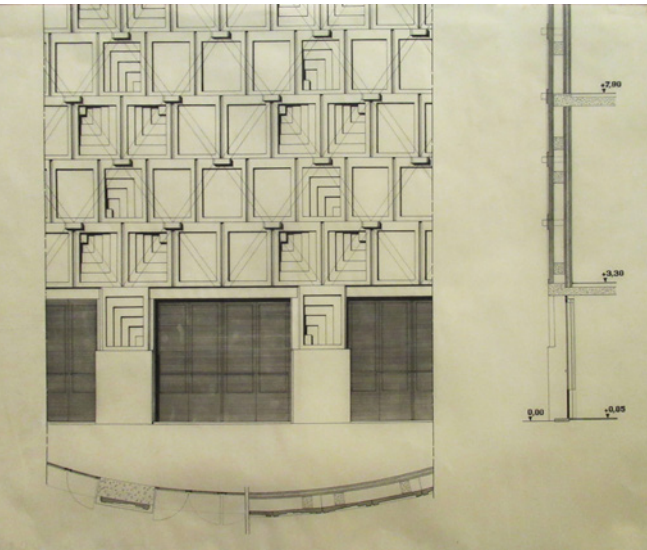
The competition project for the Theater of Alessandria, 1959. Detail of the external wall, 1:20 scale. (CASVA, AA archive collection, drawing no. 1819).
